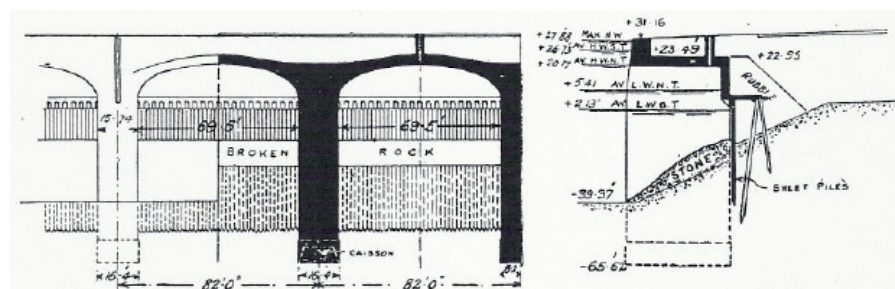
Front view and cross-section of quay wall, Le Havre, 1923 [Duplat Taylor 1949]
